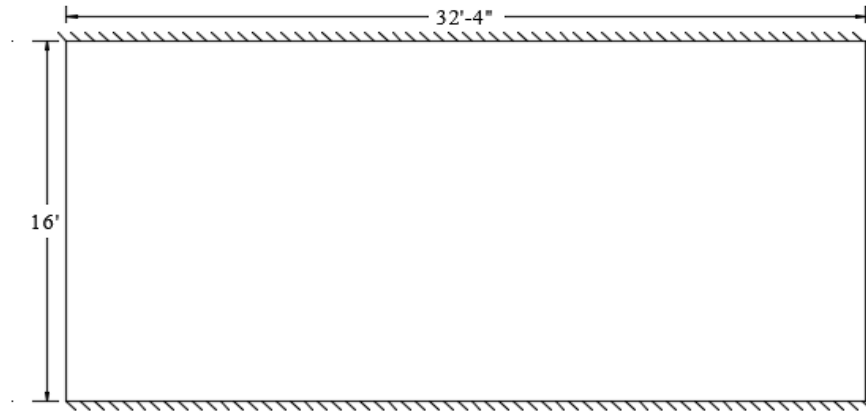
Plan of flat slab bridge TRU-5-28.97.
